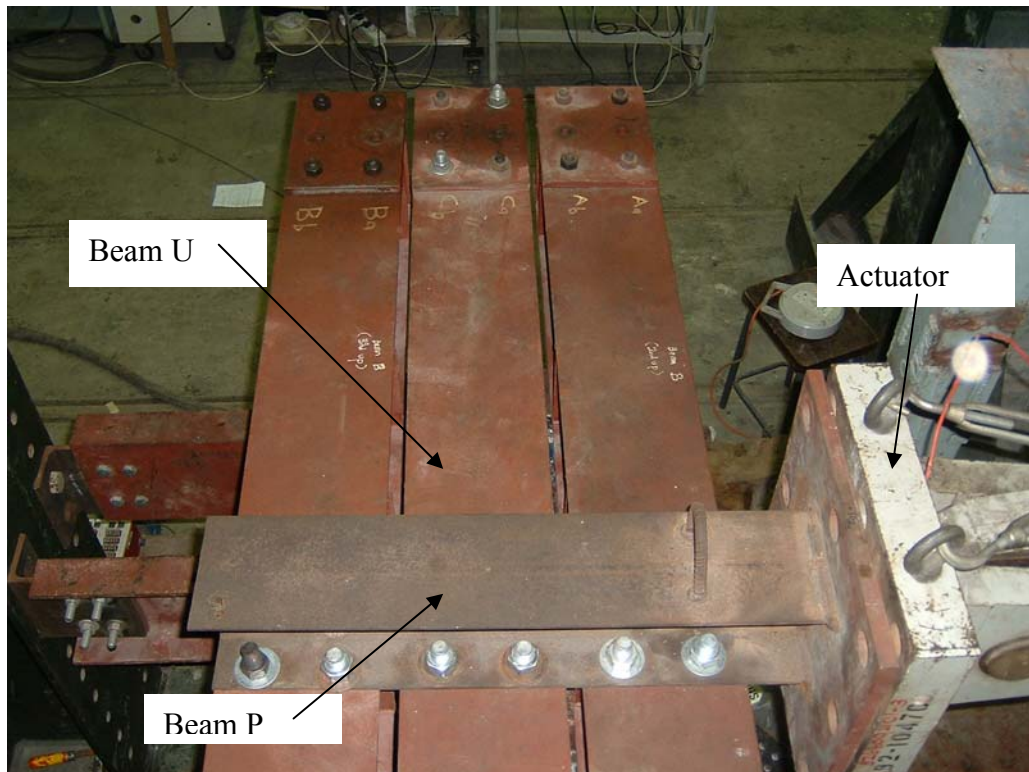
3D view of connections of actuator to P beam and P beam to U beams
